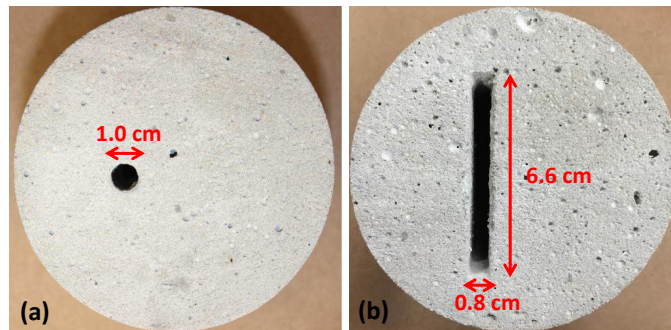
Specimens with physically-simulated cracks; (a) specimen with cylindrical through-crack and (b) specimen with plate-like crack.
